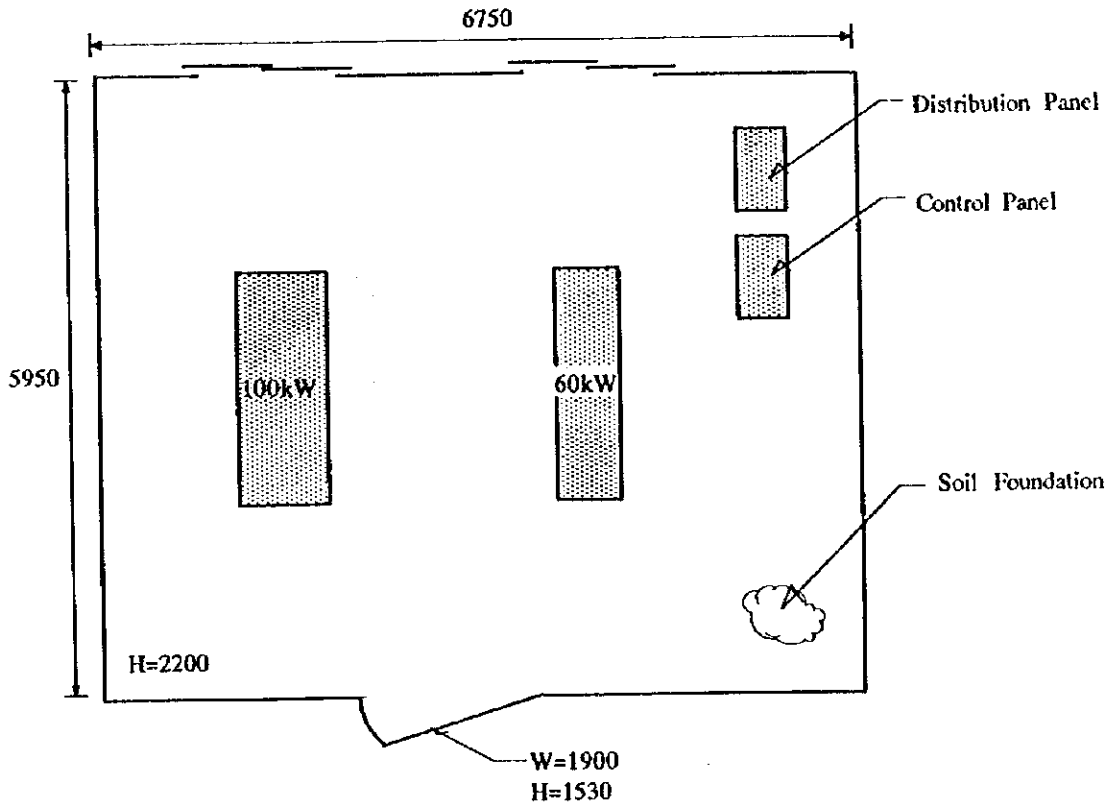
42 Layout Drawing of Tsagaan-Uur
